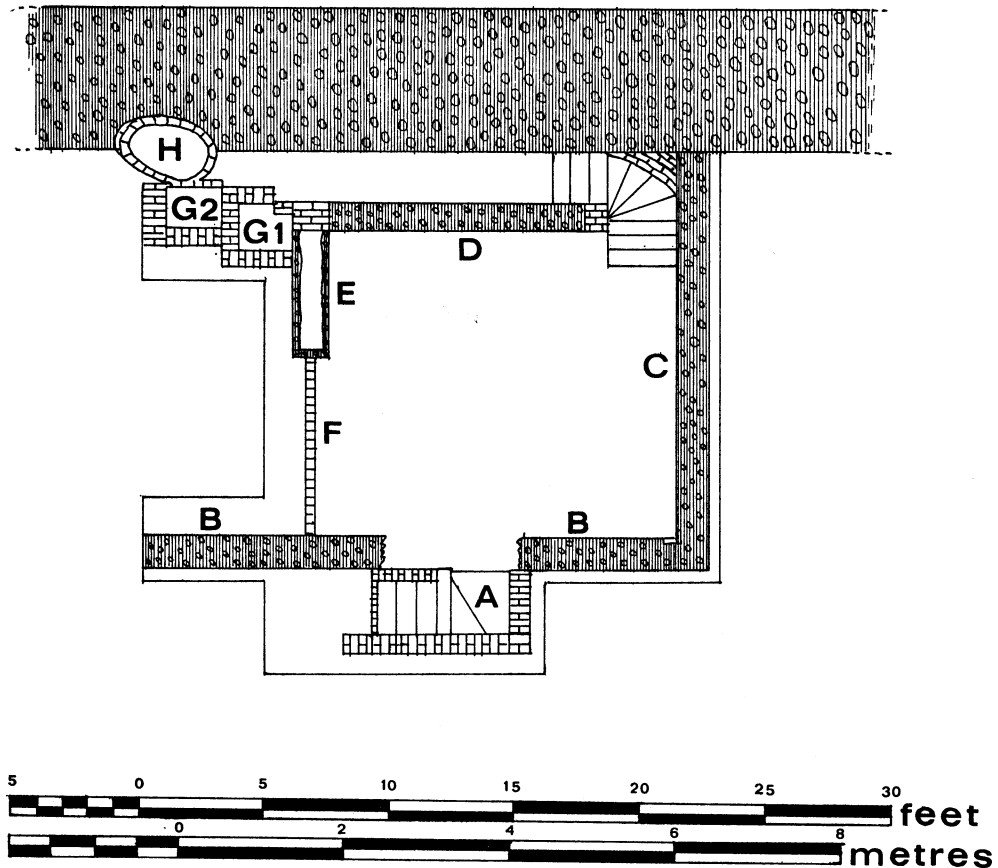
Adjoining the Refectory Wall : Trench XX.
